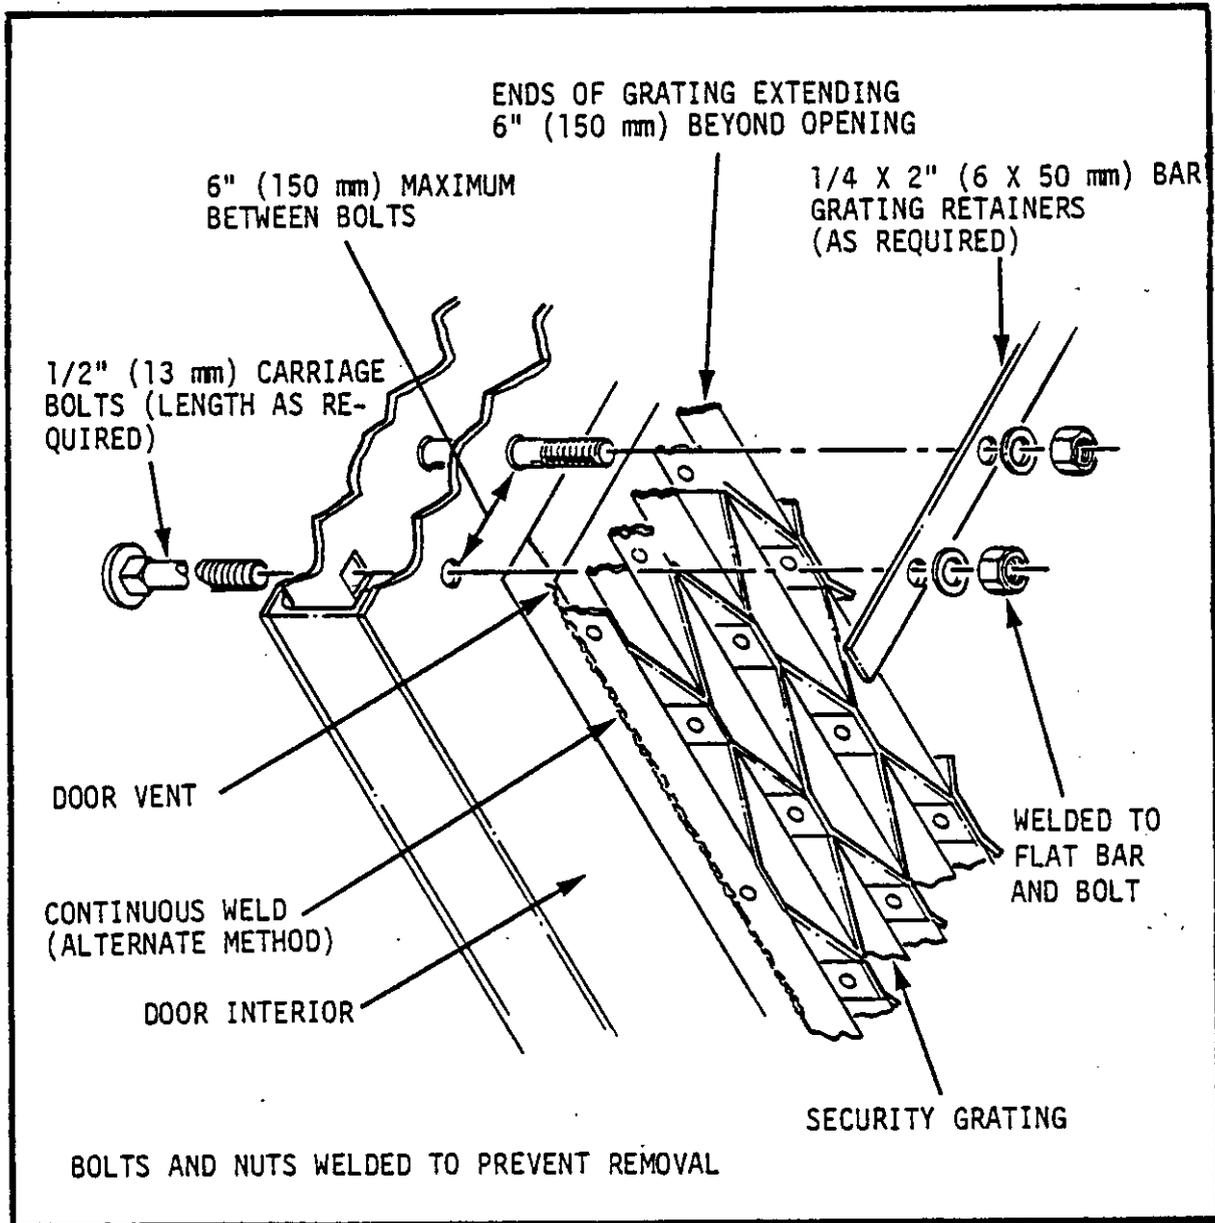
Security intrusion protection plan for hardening a typical door ventilator.
